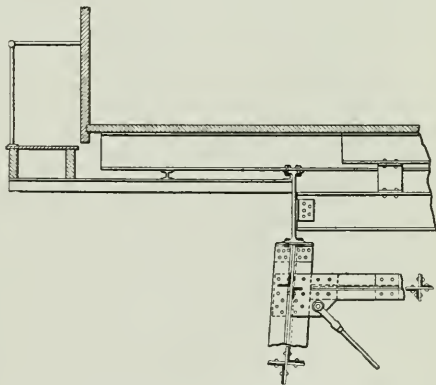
Detail View of Arrangement of Steel I-beam Grillage for Support of Tank.
